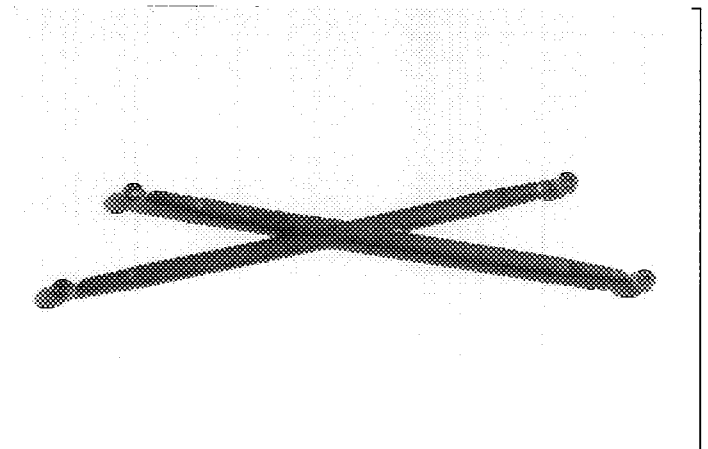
ALTERNATIVE REINFORCEMENT
